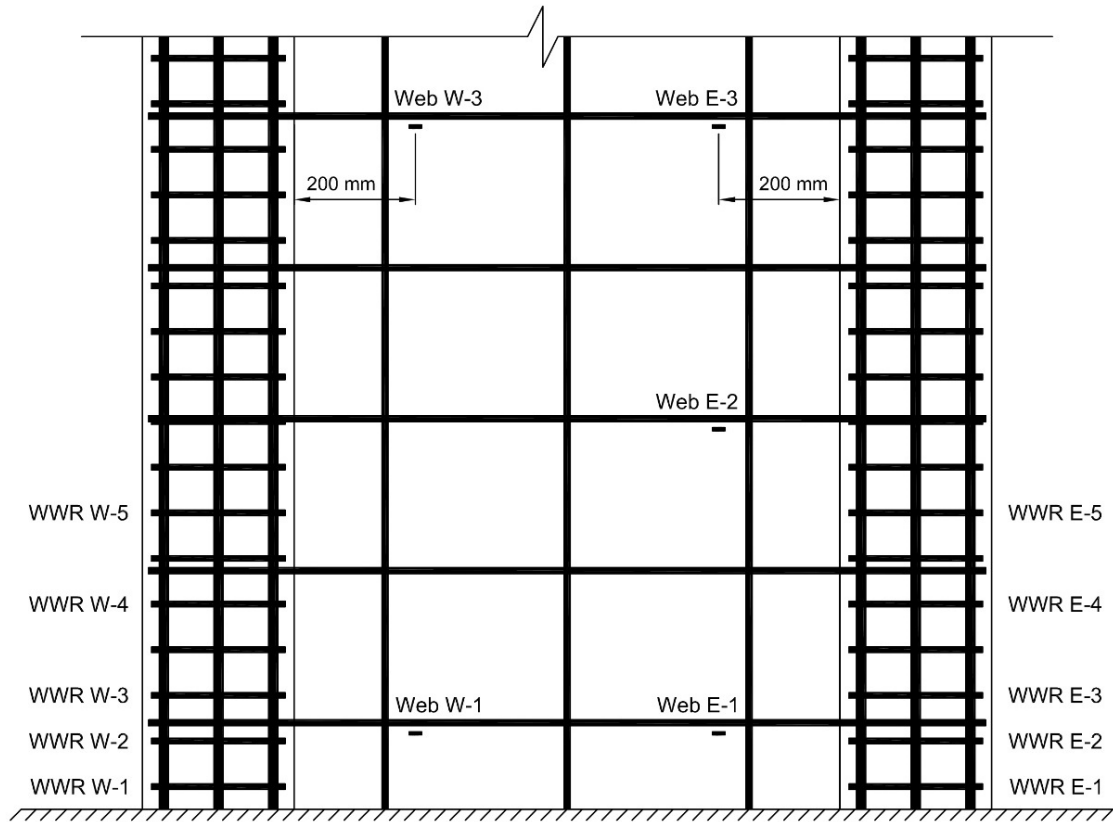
Shear Wall No. 3 – WWR Grid Labels and Web Reinforcement Strain Gauges
